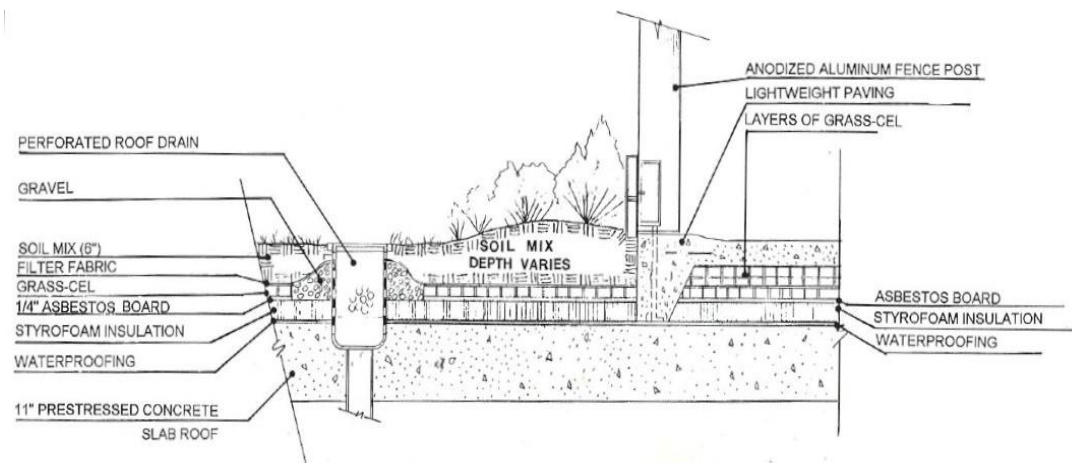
Section of extensive roof top garden. (Laterza, 1975, p.28)
